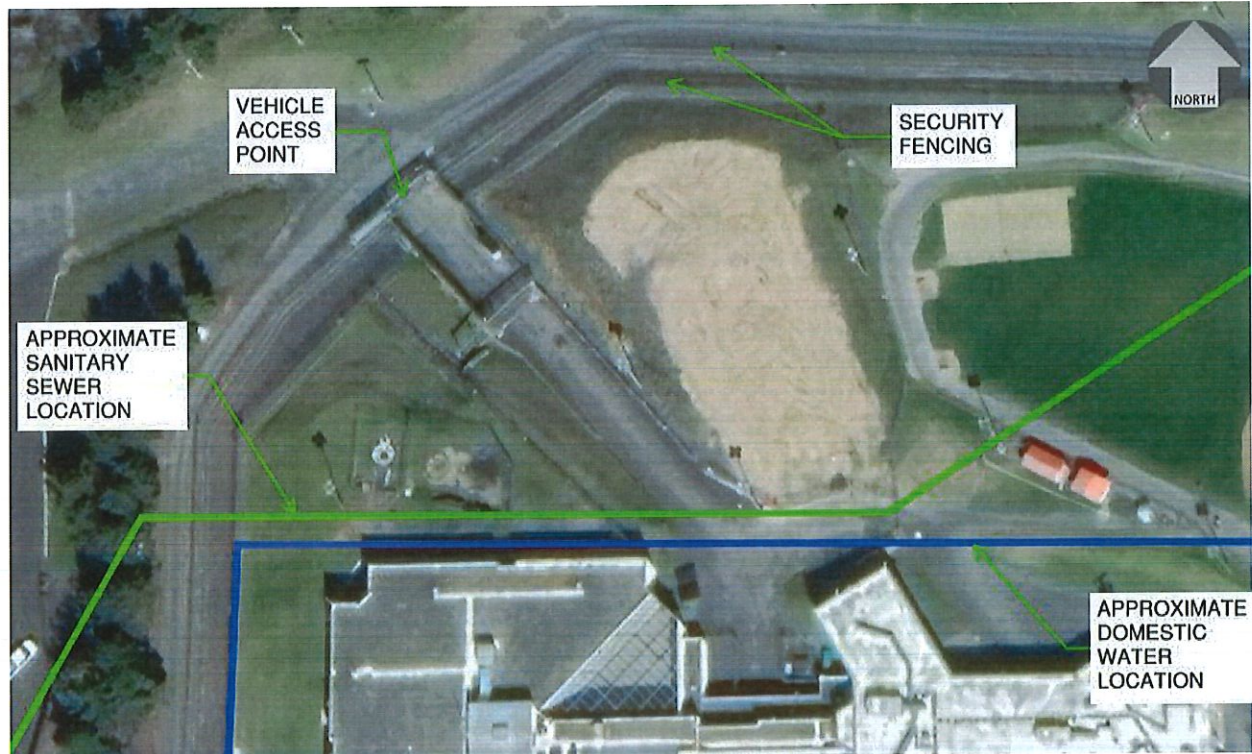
SITE 3 ACCESS AND UTILITY LOCATIONS
